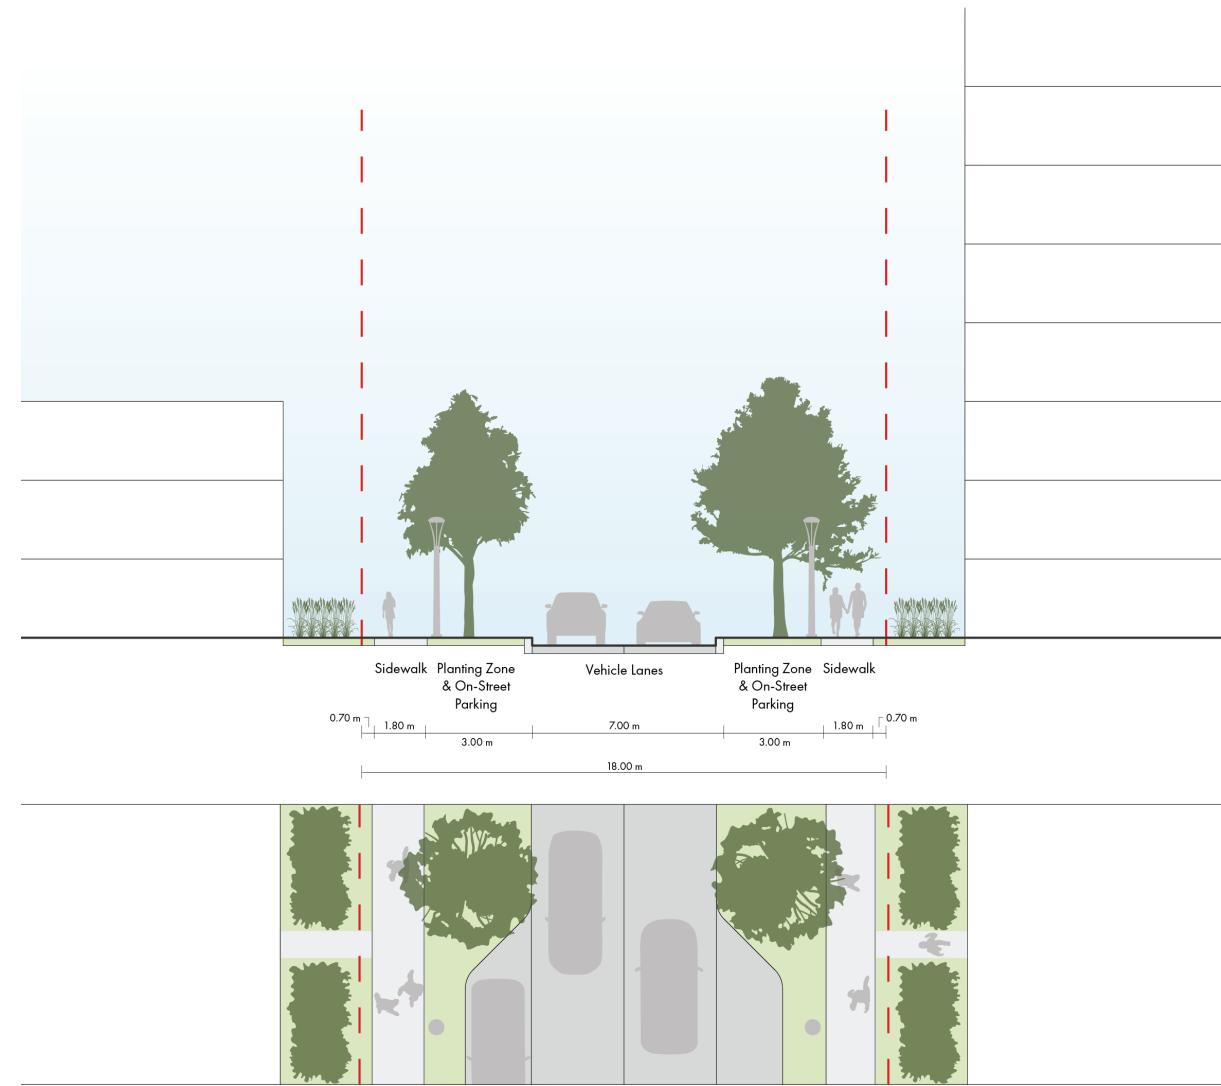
Proposed Local Street cross section in accordance with Secondary Plan requirements and City of Guelphs Complete Street Guidelines
